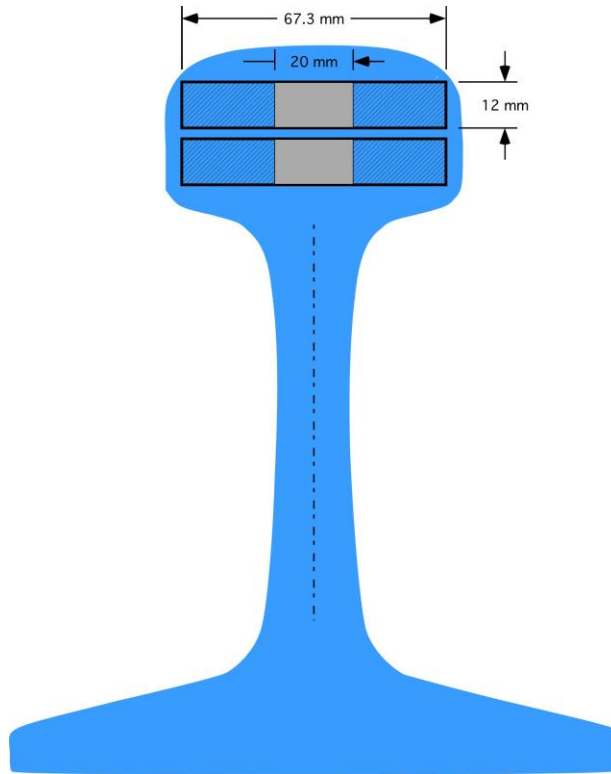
Cross-section view of CCT fracture specimens cut from rail heads.
